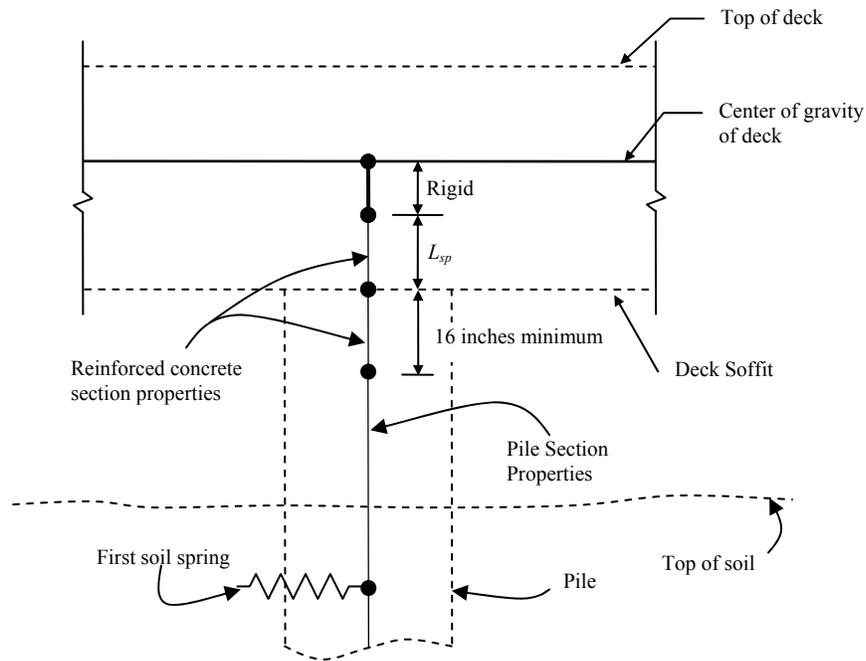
Modeling of Pile-to-Deck Connection (Not-to-Scale)
